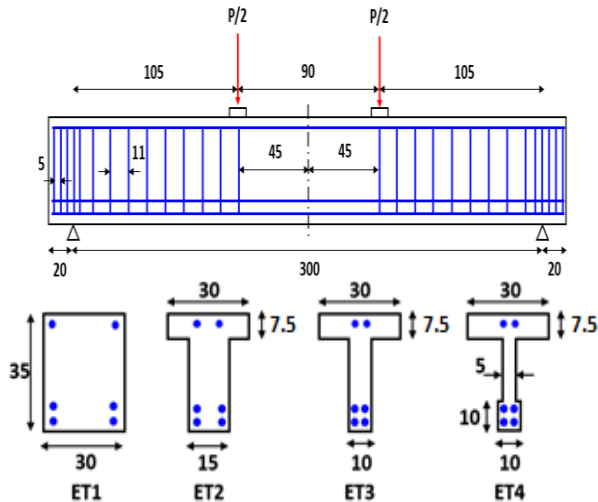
Sketch of the longitudinal and cross sections of the beams tested by Leonhardt and Walther (1962) (dimensions in cm)
